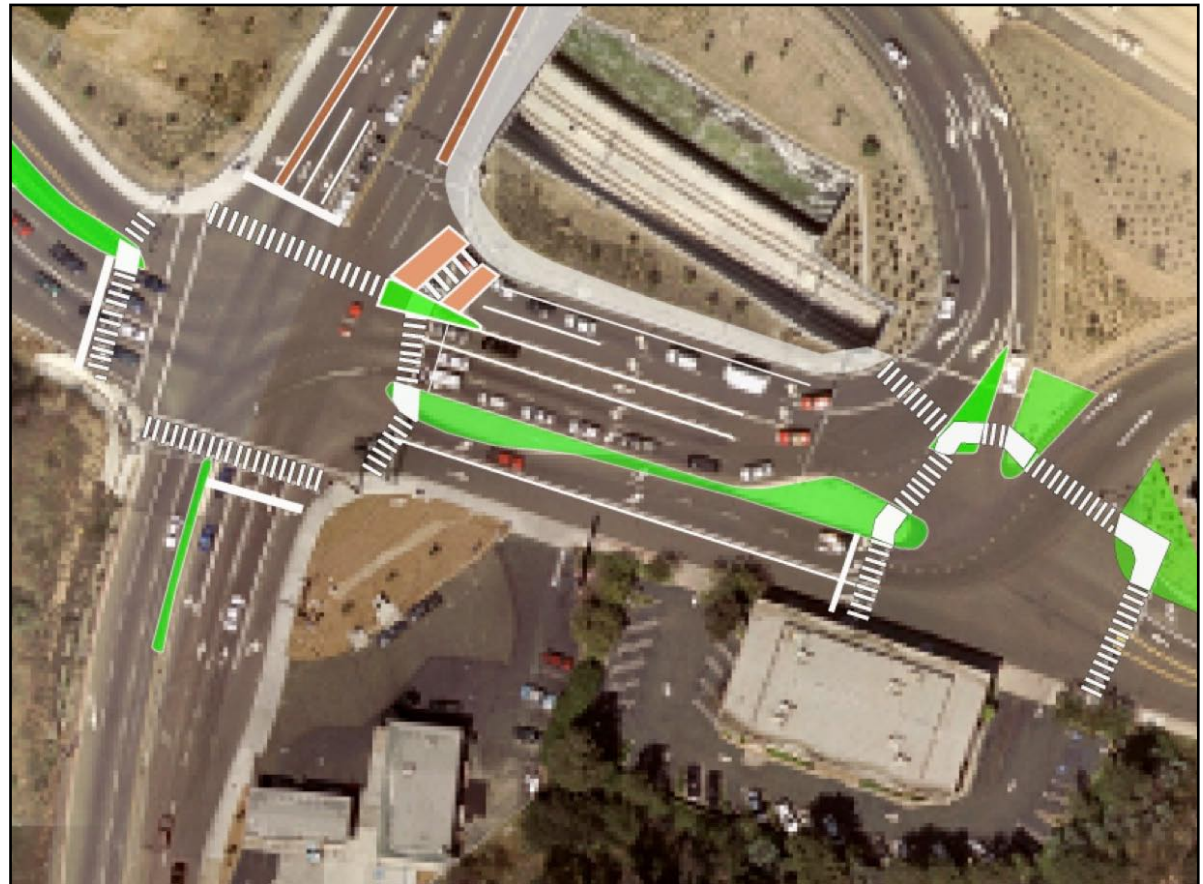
Design recommendations for area south of the 70th Street bridge.
